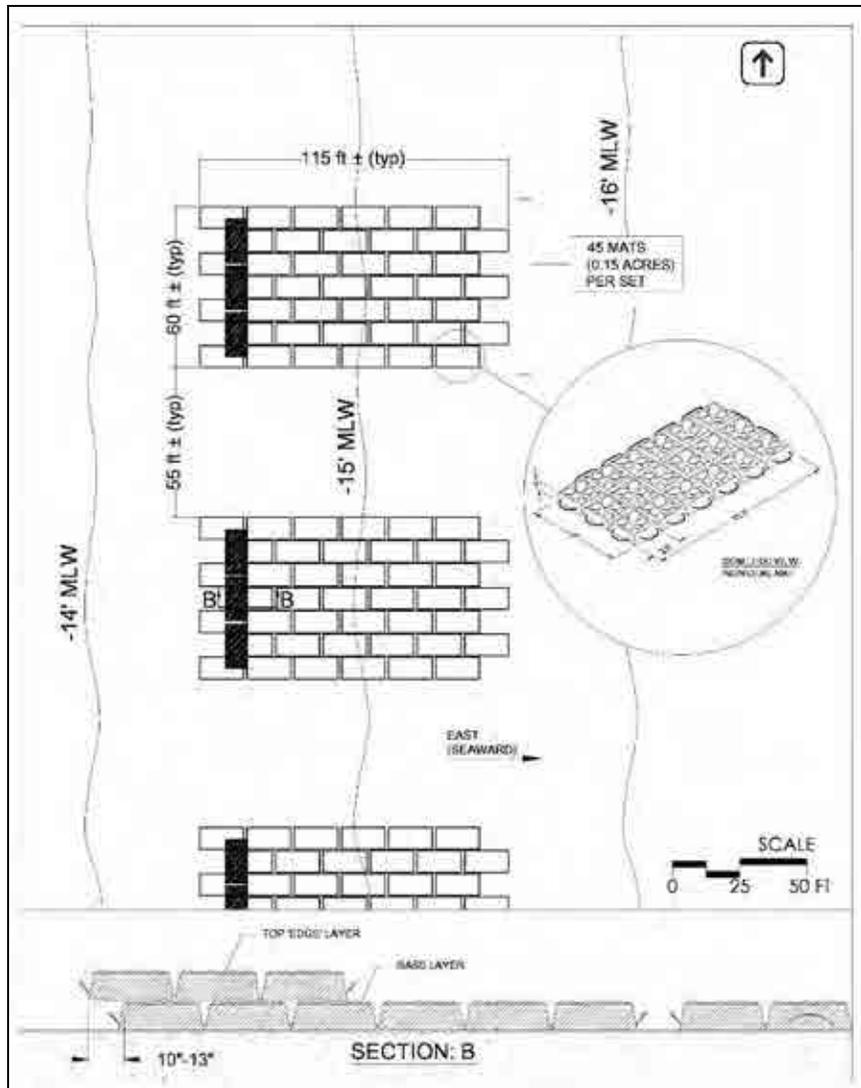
Proposed layout (and typical section) of articulated reef mats within a “set” and reef unit.
